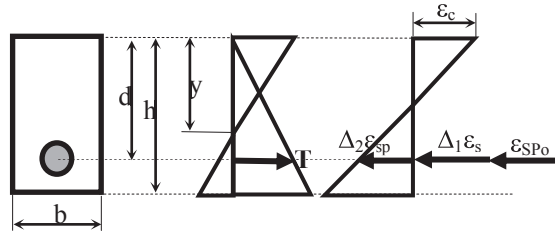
Block diagram illustrating strains and forces in the prestressed concrete section (Raka 1993)
